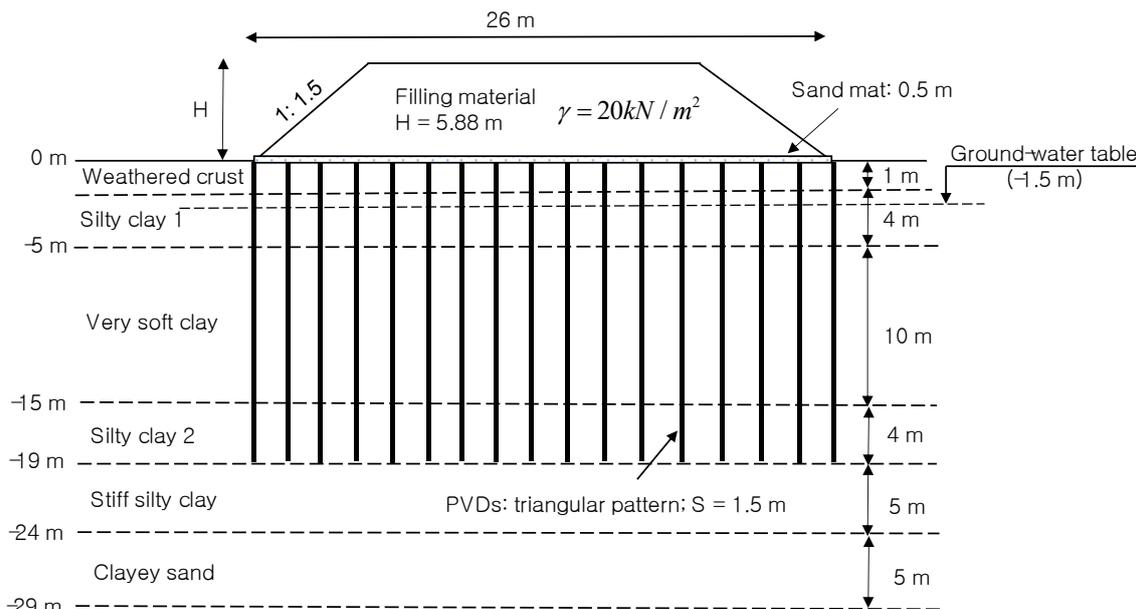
Cross-section and arrangement of PVD under embankment test of Eastern China
